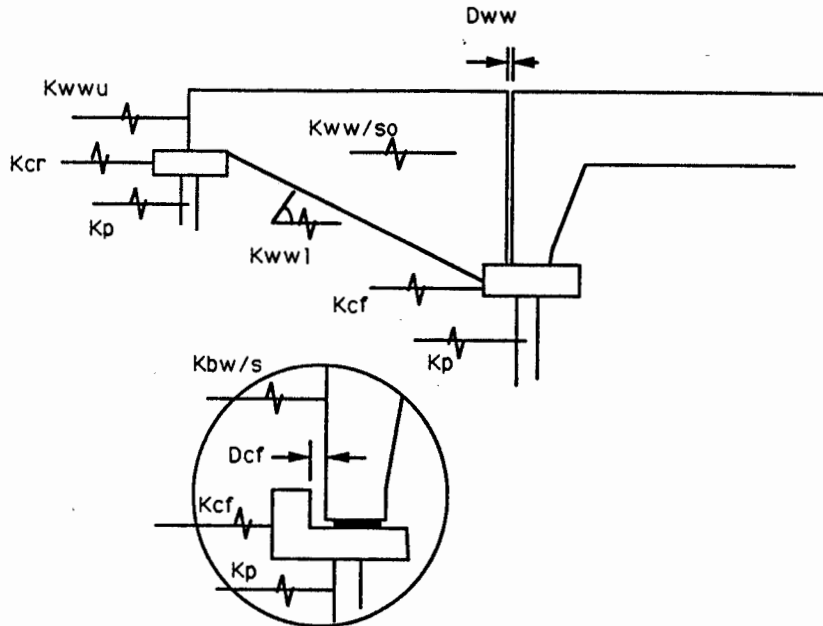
Elevation View of Longitudinal West Abutment Resisting Elements
